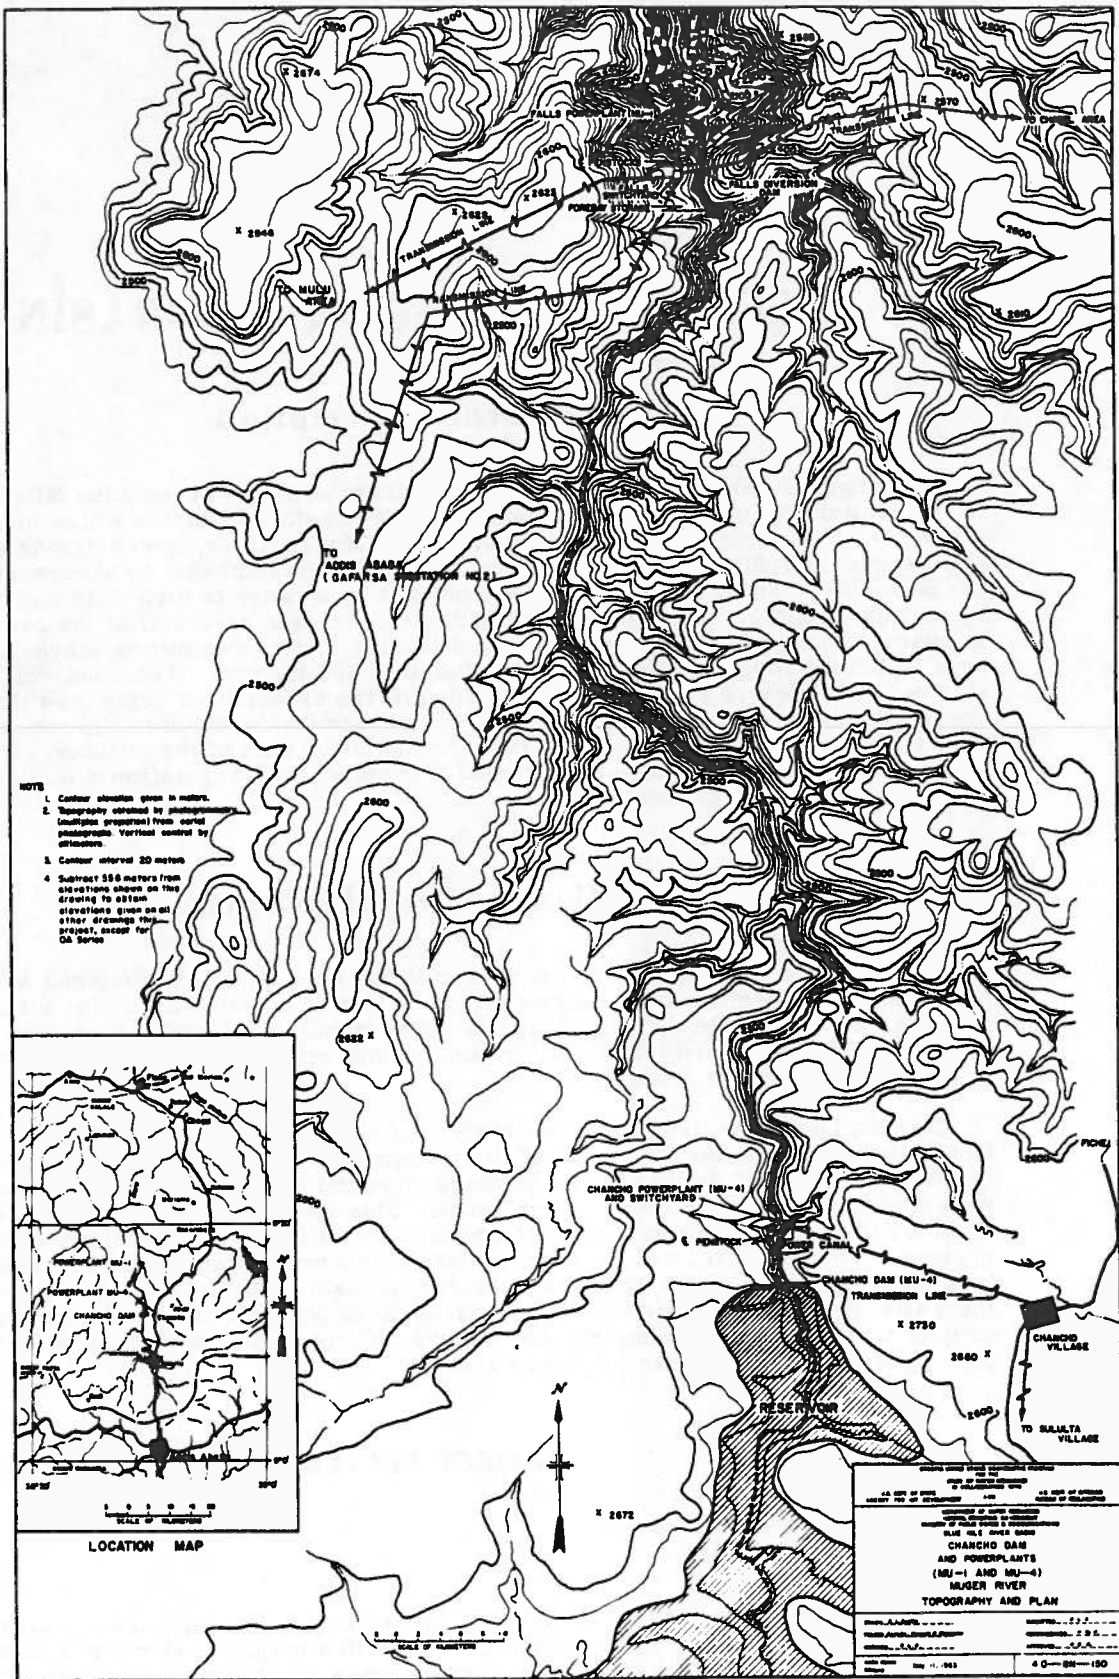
Chancho Dam and Power Plants (MU-1 and MU-4)--Topography and Plan
